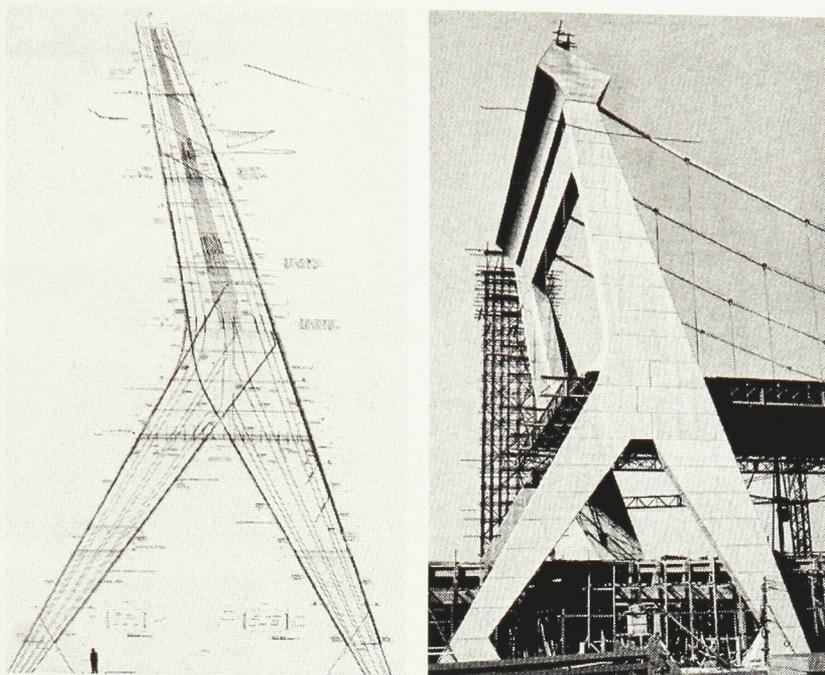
Burgo Paper Mill, Mantua [Concrete Structure].
